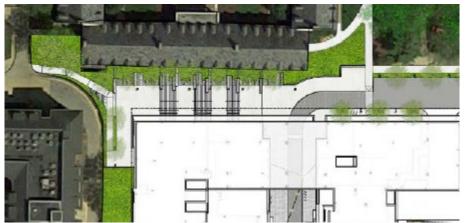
Grand staircase that will connect Lehigh Road to UMD Campus to the west.
